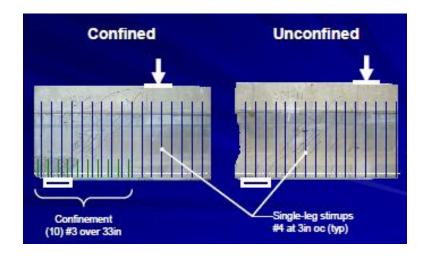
Specimen Reinforcement and Confinement (Ross 2010)
